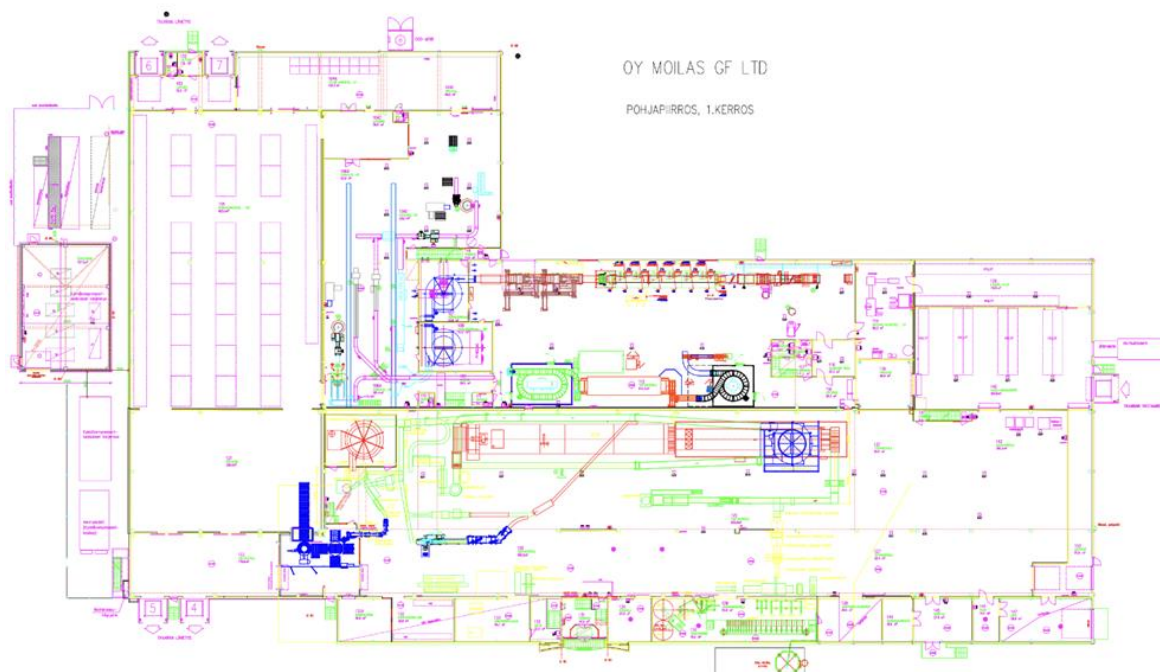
Current layout of Virallinen GF Layout, illustrating existing spatial arrangement (Aki, 2024).
